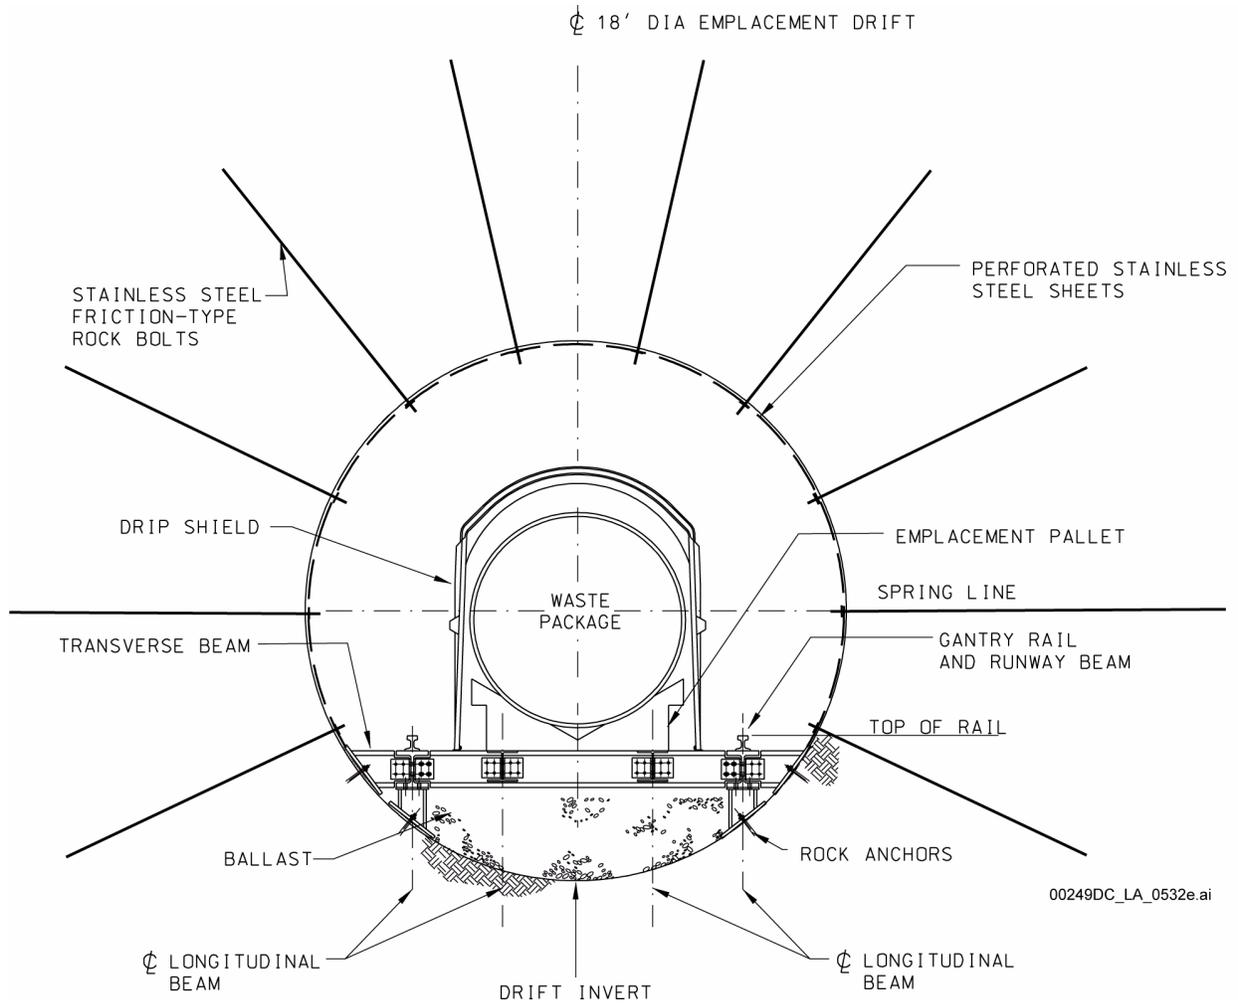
Typical Emplacement Drift Cross Section
